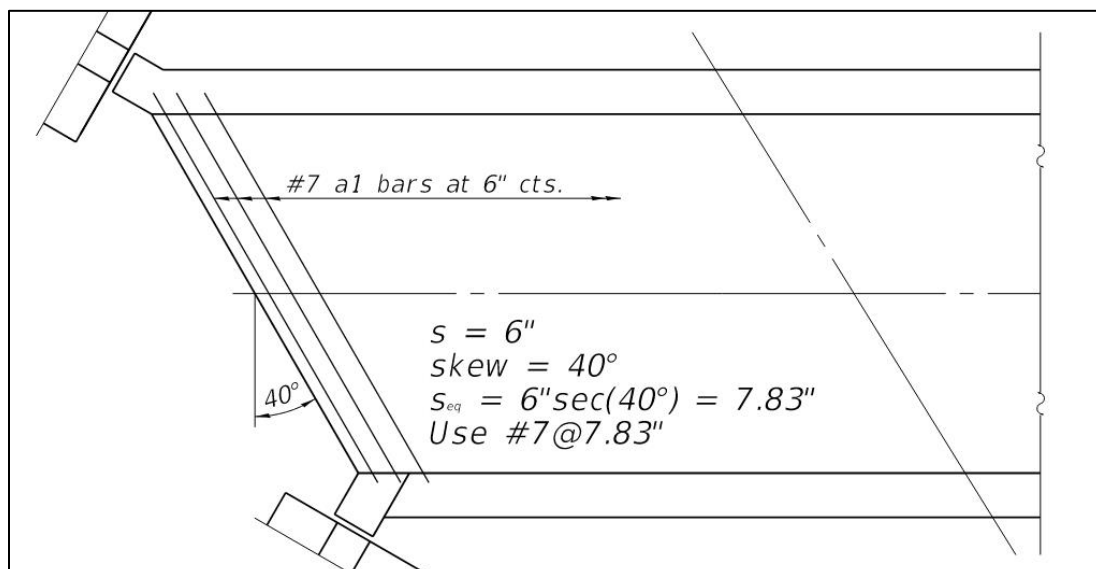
SPACING DETAILED PARALLEL TO THE SIDEWALLS
